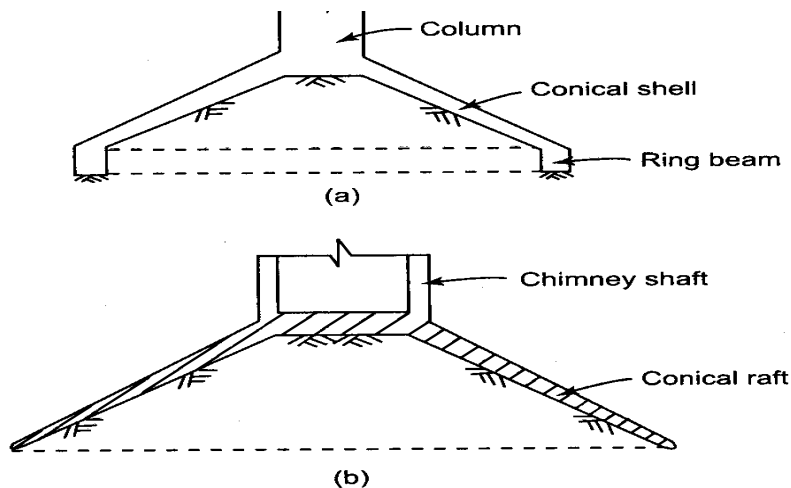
Conical Shell foundations.(a) column footing,(b) chimney raft
